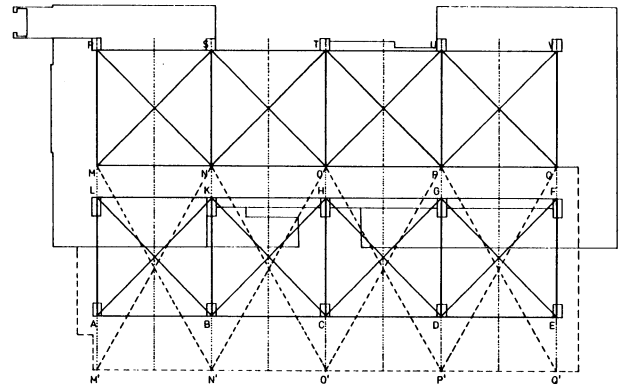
Schindler, Beach House, second-floor plan, proportional analysis (author).
